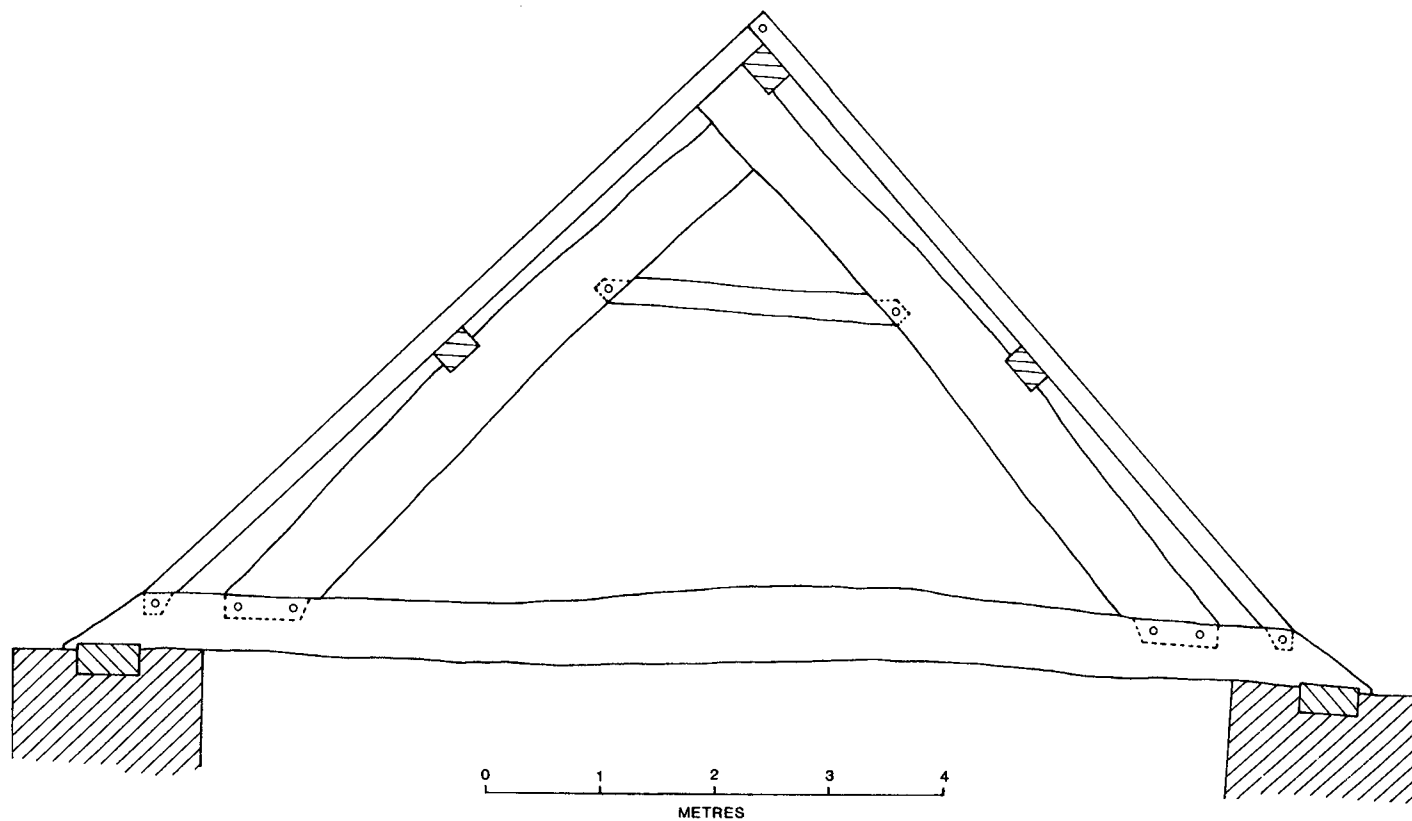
Roof truss C as originally built. Truss B is similar, but trusses A, D and E have no collar.
